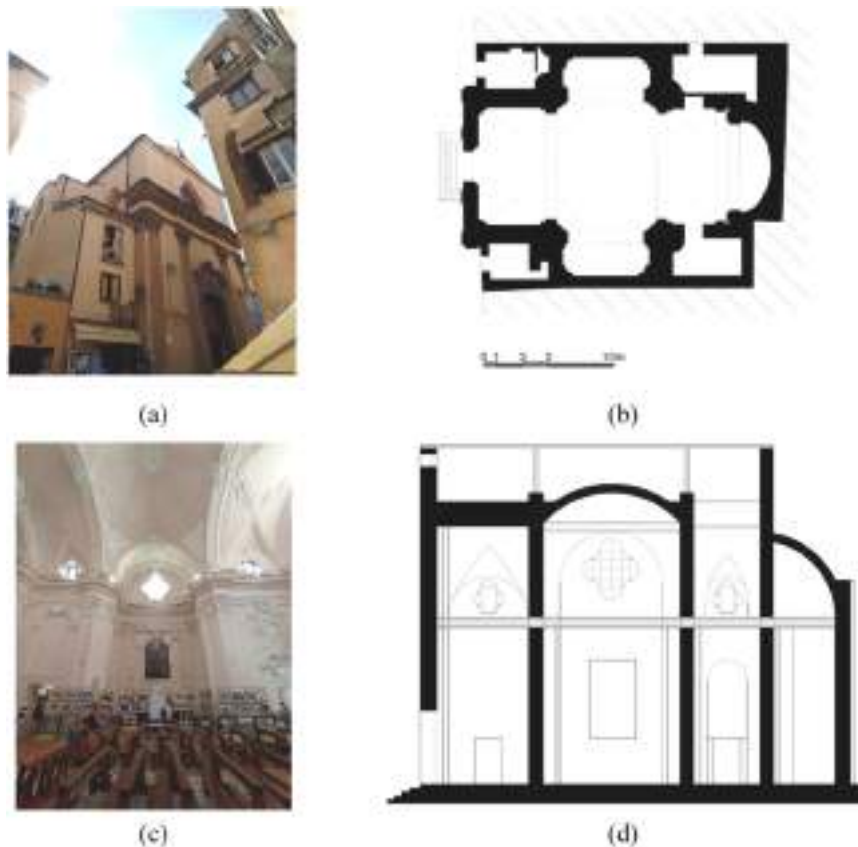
Photographic documentation of the church of the *Addolorata*: a) Main façade; b) Ground floor layout; c) Nave; d) Cross-Section.
